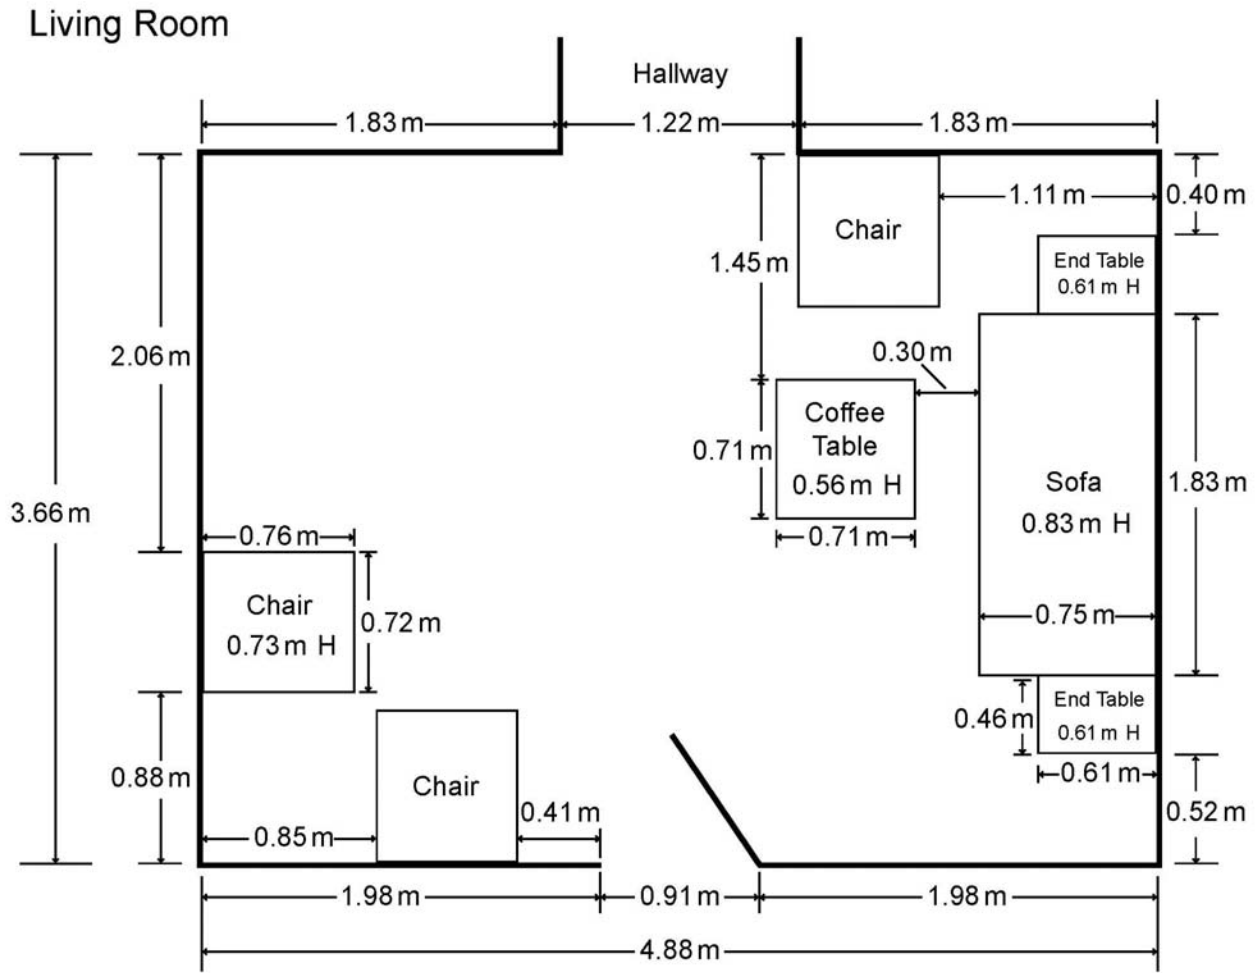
Schematic floor plan of living room with furniture locations.
